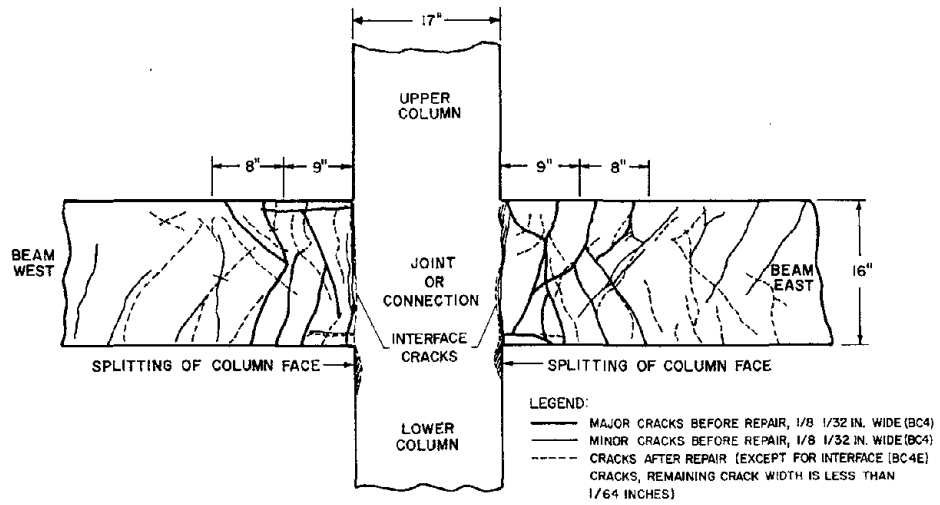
Crack Patterns Before and After Epoxy Repair
